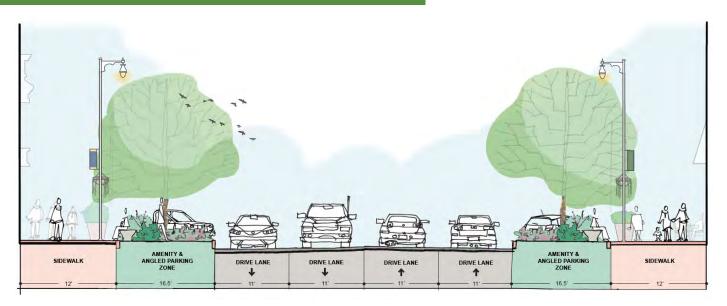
Conceptual 3rd Street Cross-Section p*rovides a section of what 3rd Street could look like. With bulb-outs at the end of the 9-foot amenity and parking zones at the cross streets, additional space could be given to pedestrian seating, lighting, and greenery.
